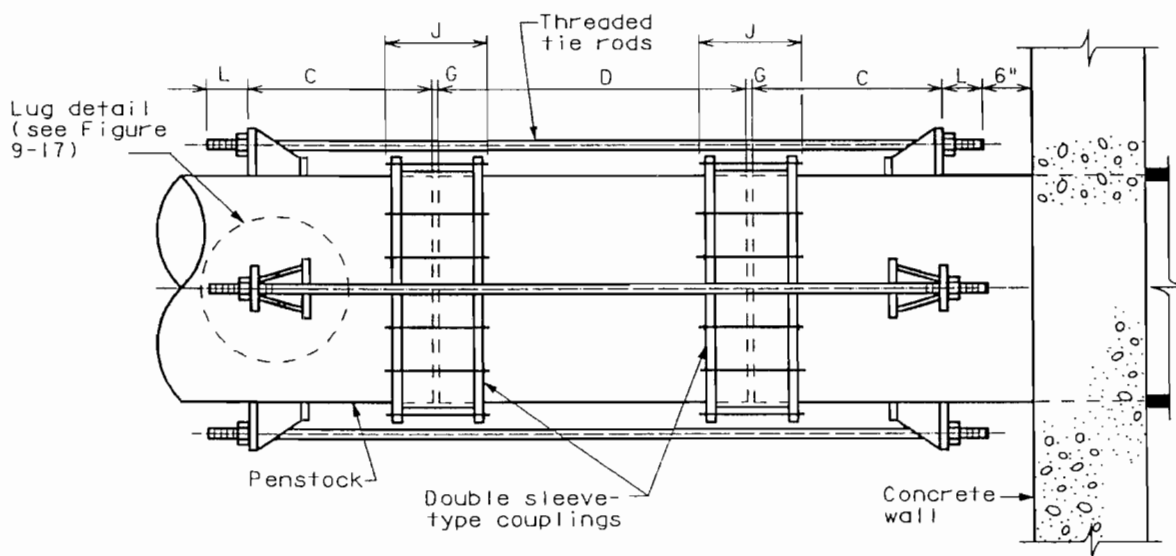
Joint Harness for Double-Bolted, Sleeve-Type Coupling Installation
